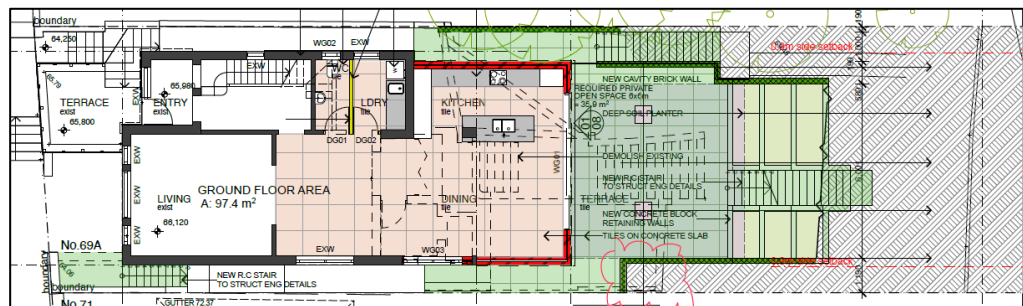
Proposed primary dwelling ground floor plan (Source: Fortly & Grant Architecture Pty Ltd)
